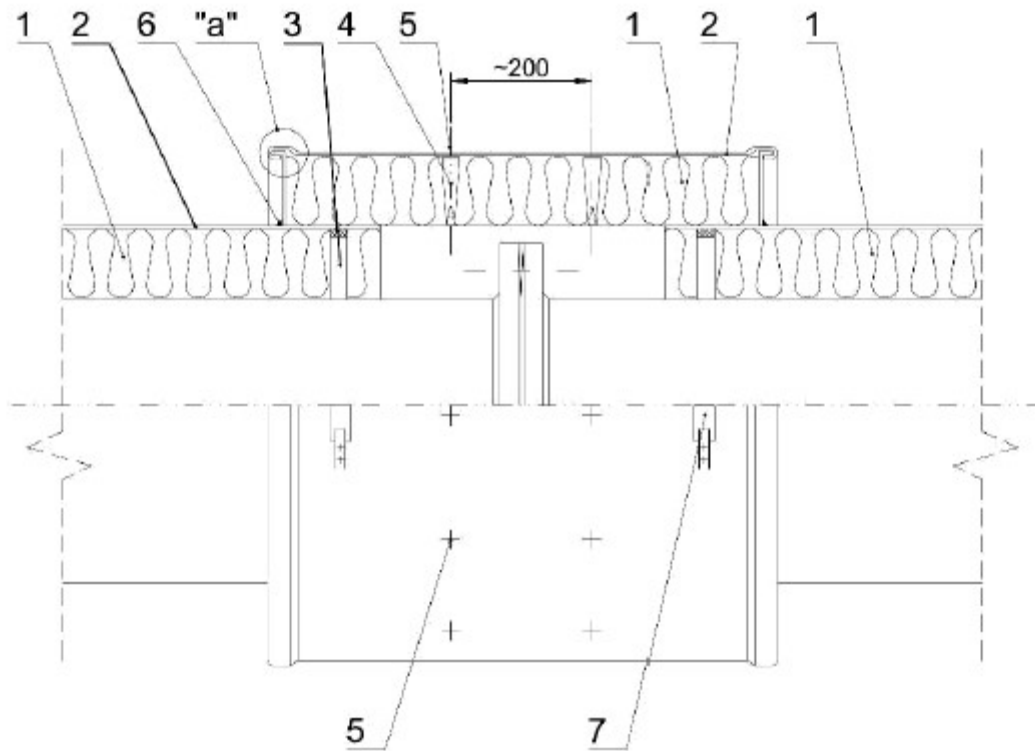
Insulation of flange connections on horizontal pipelines. 1– Insulation mat, 2– Insulation covering jacket, 3 – Supporting structure, 4 – Elements fastening insulation, 5 – Tubular rivet with fastening core,
